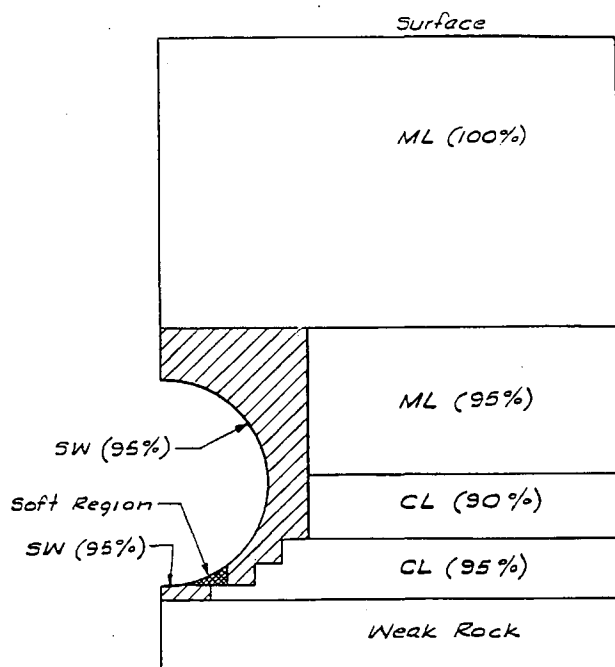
Finite element model of pipe-soil installation at Site 1.
